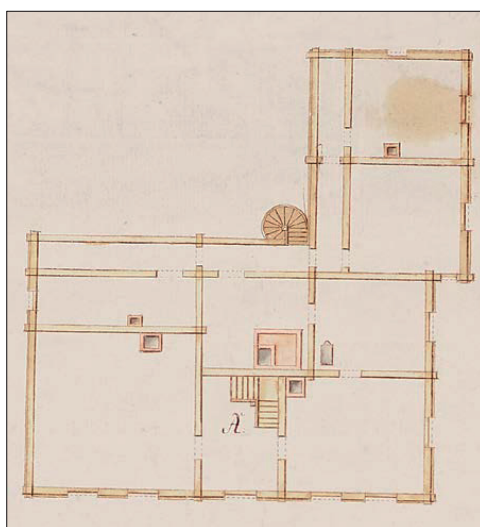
Detail from Eckleff's plan of 1758 showing the first floor (2. *etasje*) of the second residence. North to bottom.¹²⁸³
